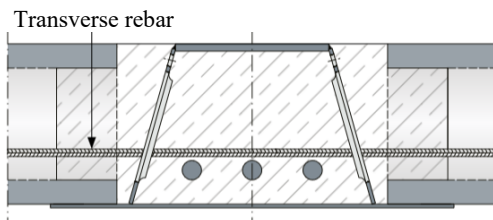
Example of shear connection using transverse rebars – the DELTABEAM® solution [9].
